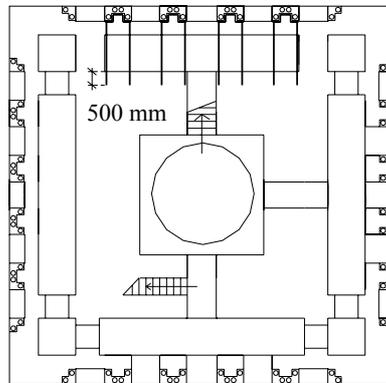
Section showing the layout of the pinning arrangement at upper level.
